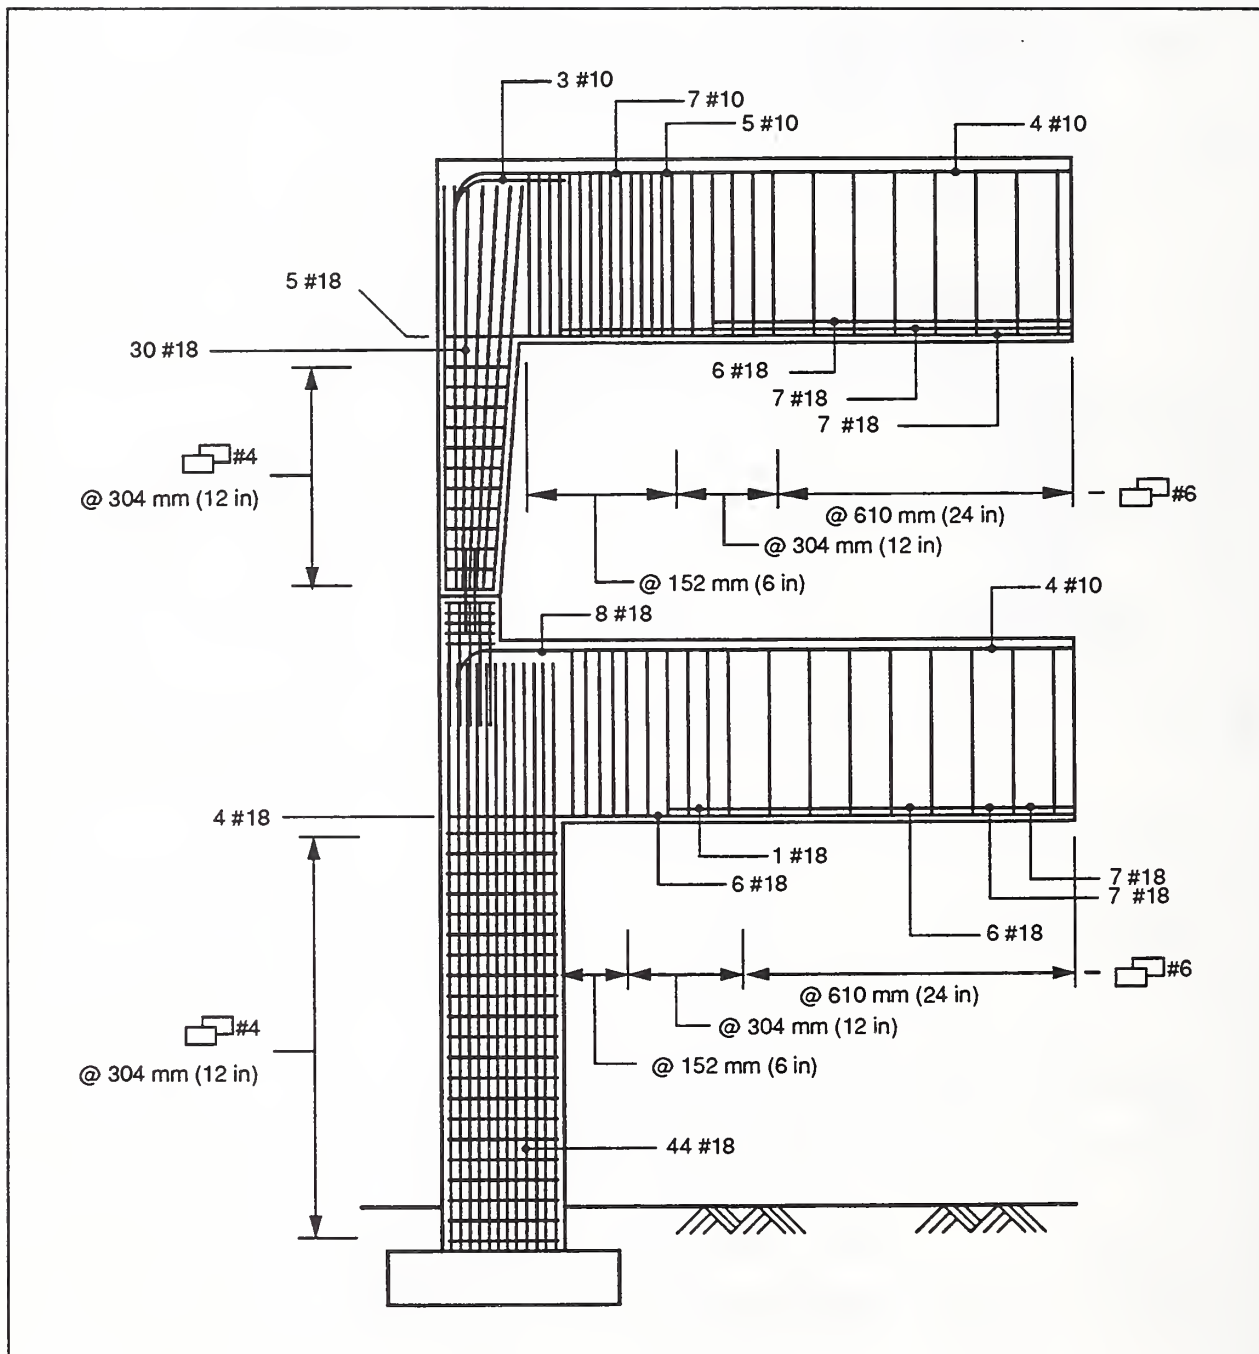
Reinforcement Layout for the Type B1 Bent
